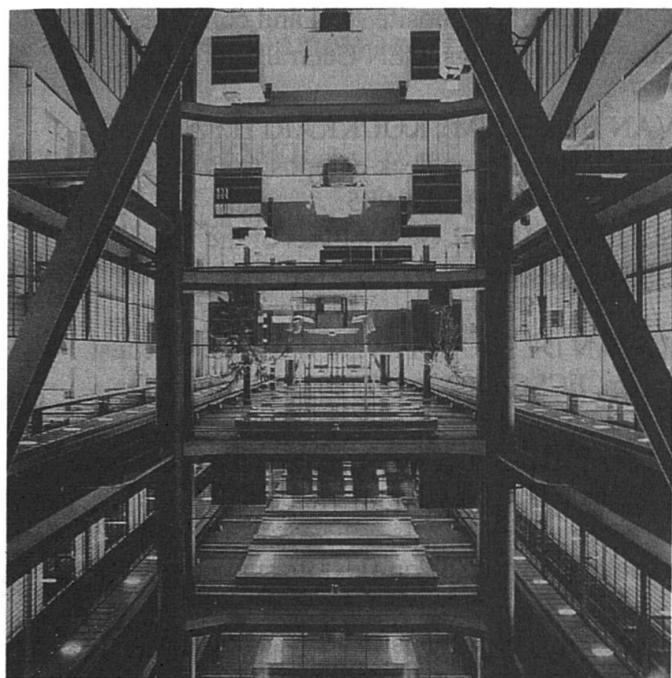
AOB, IFB slim floor based on hollow core units reinforced by stirrups at supports and by a structural topping
